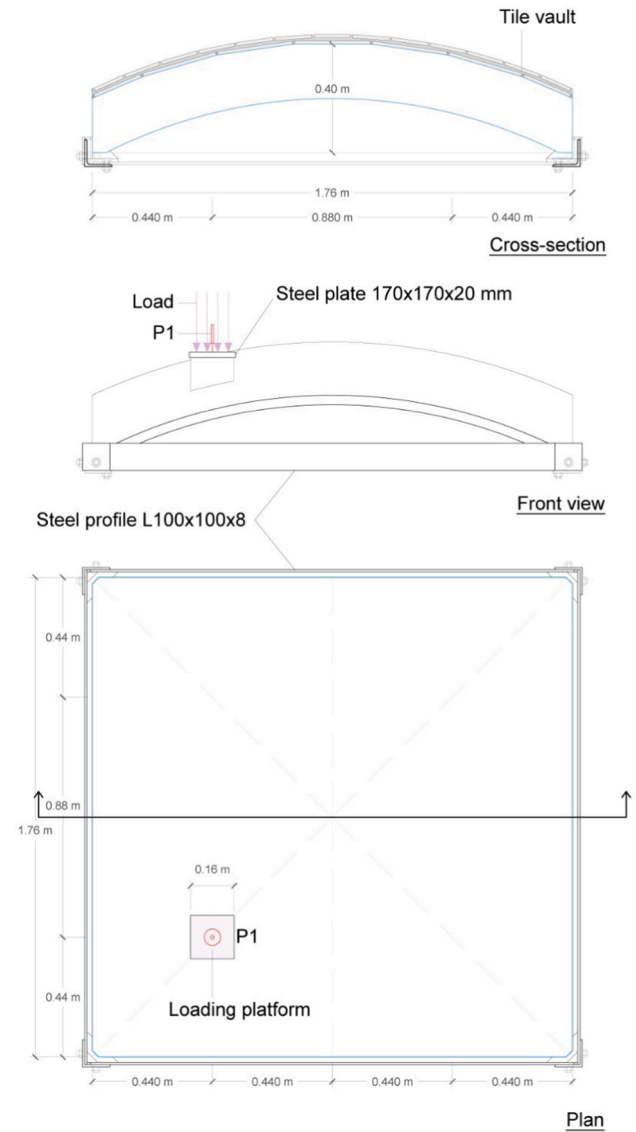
Setup of the monitoring and load test for the plain, tile-vaulted sail domes. Potentiometer indicated as P1. Top) cross-section, middle) front view, bottom) plan.
